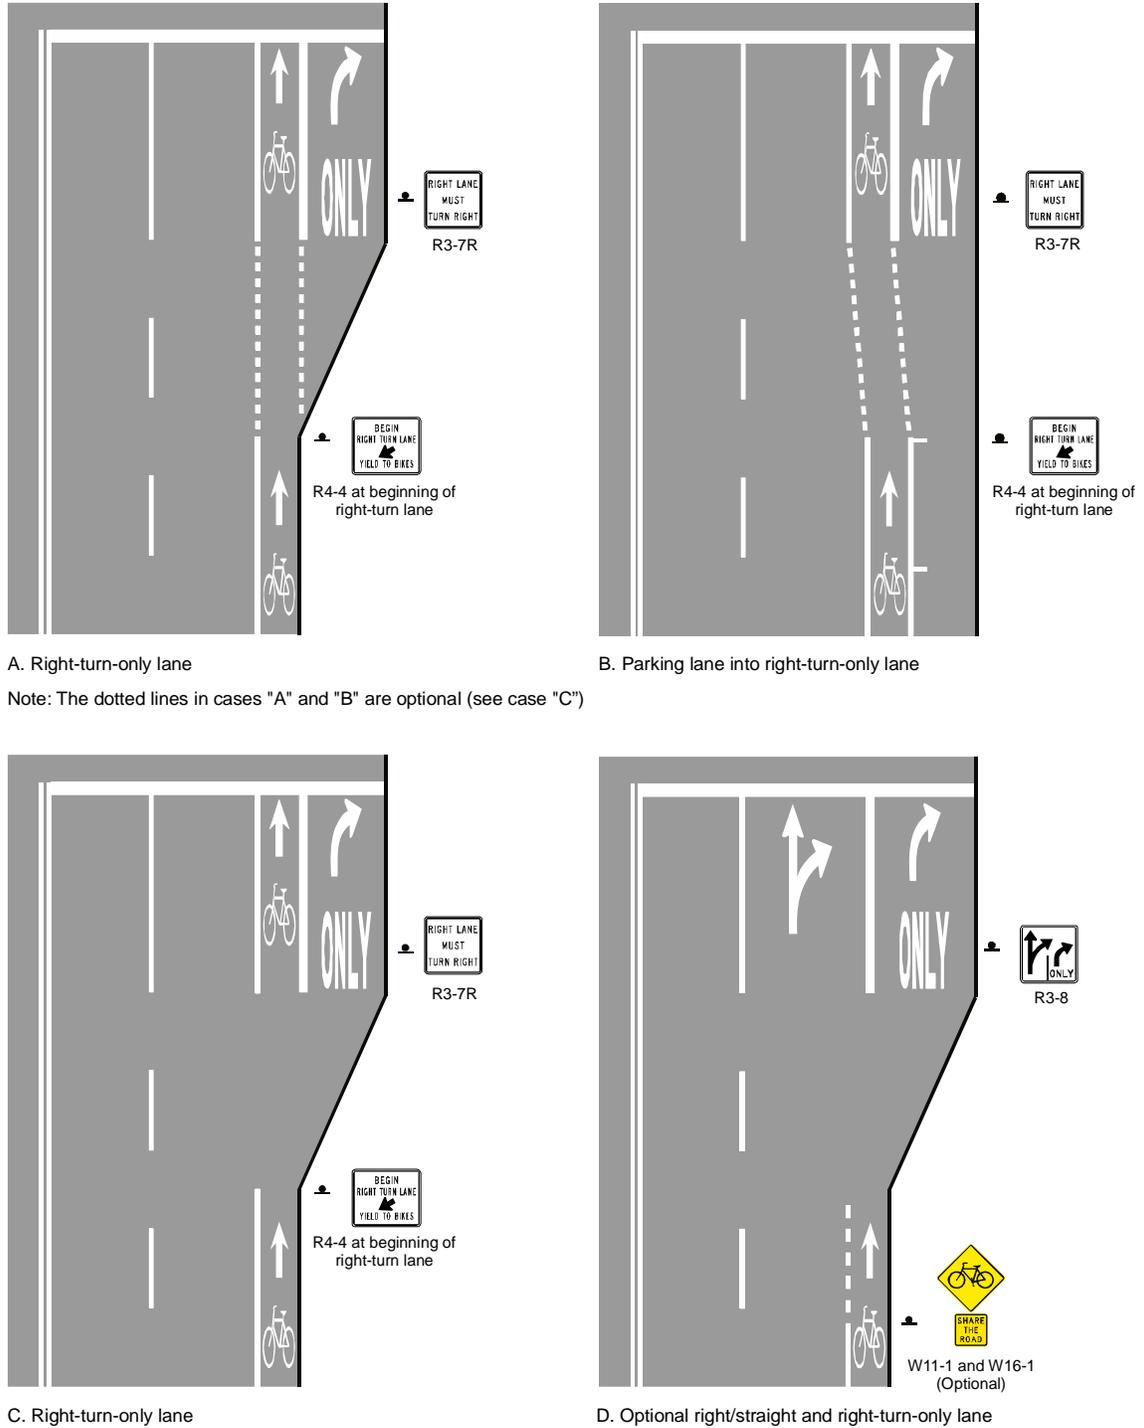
Illustration. Typical pavement markings for bike lane on two-way street.
